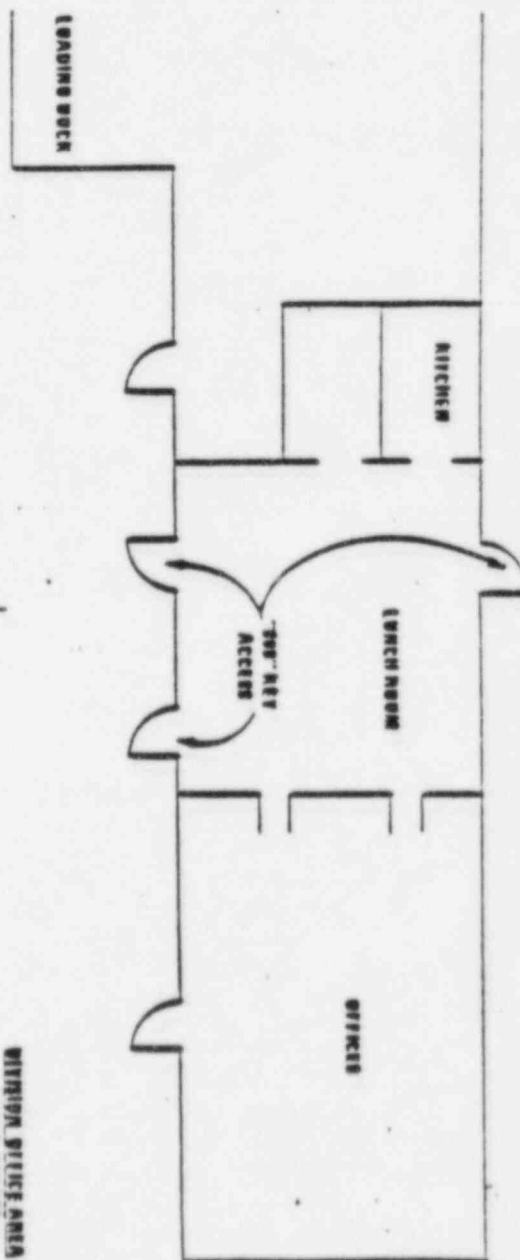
GARAGE LAYOUT AND PHONE ACCESS
